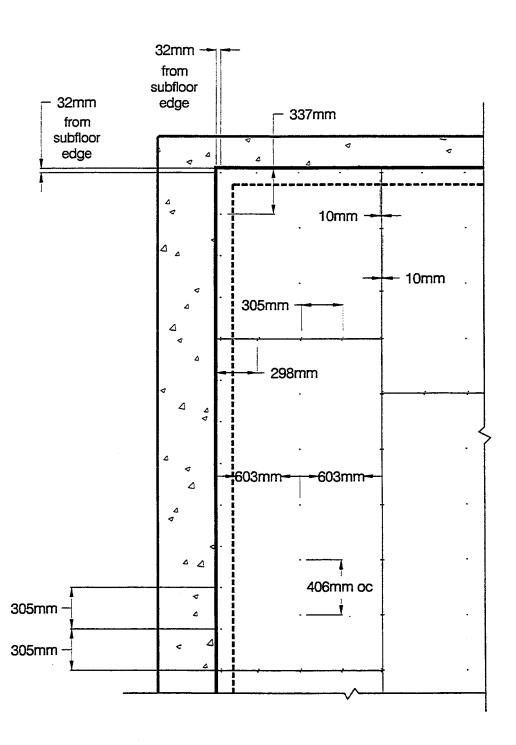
Screw pattern for single layer subfloor, joists 406 mm o.c.
